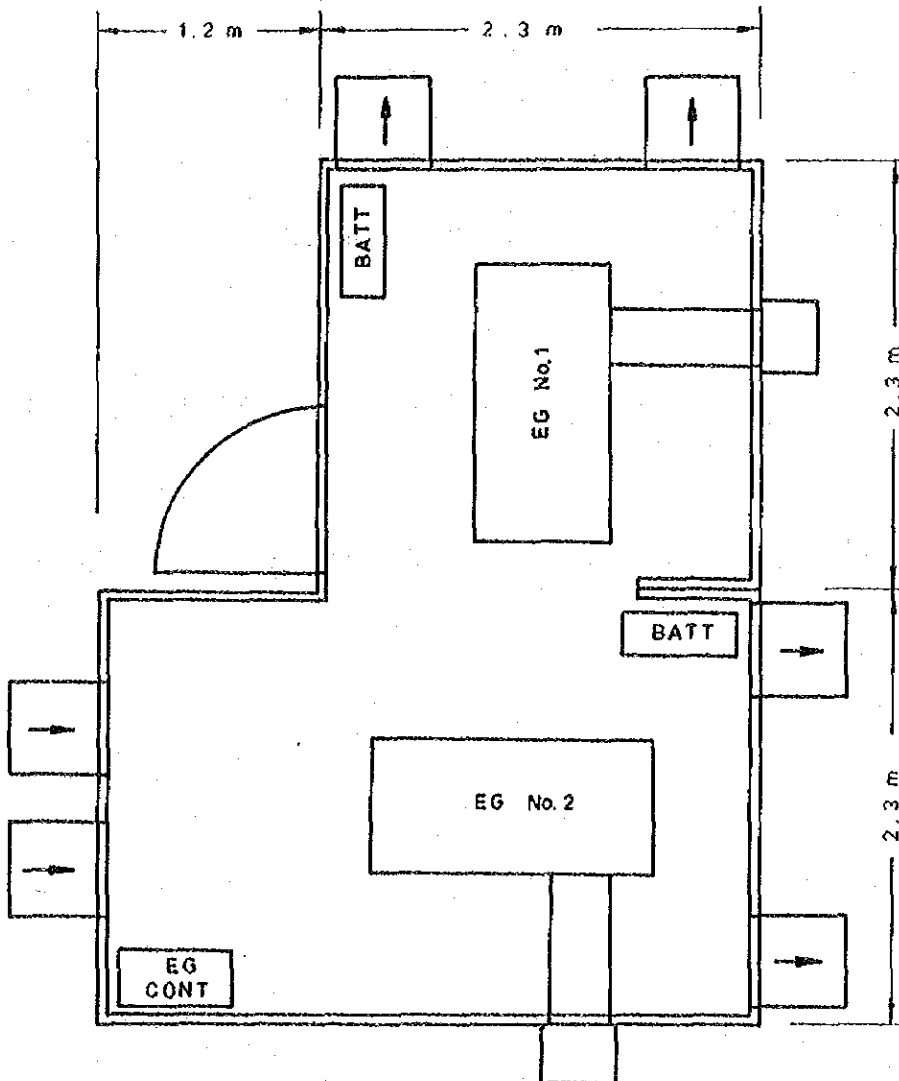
Typical Equipment Floor Layout of Master Earth Station (2/2)
